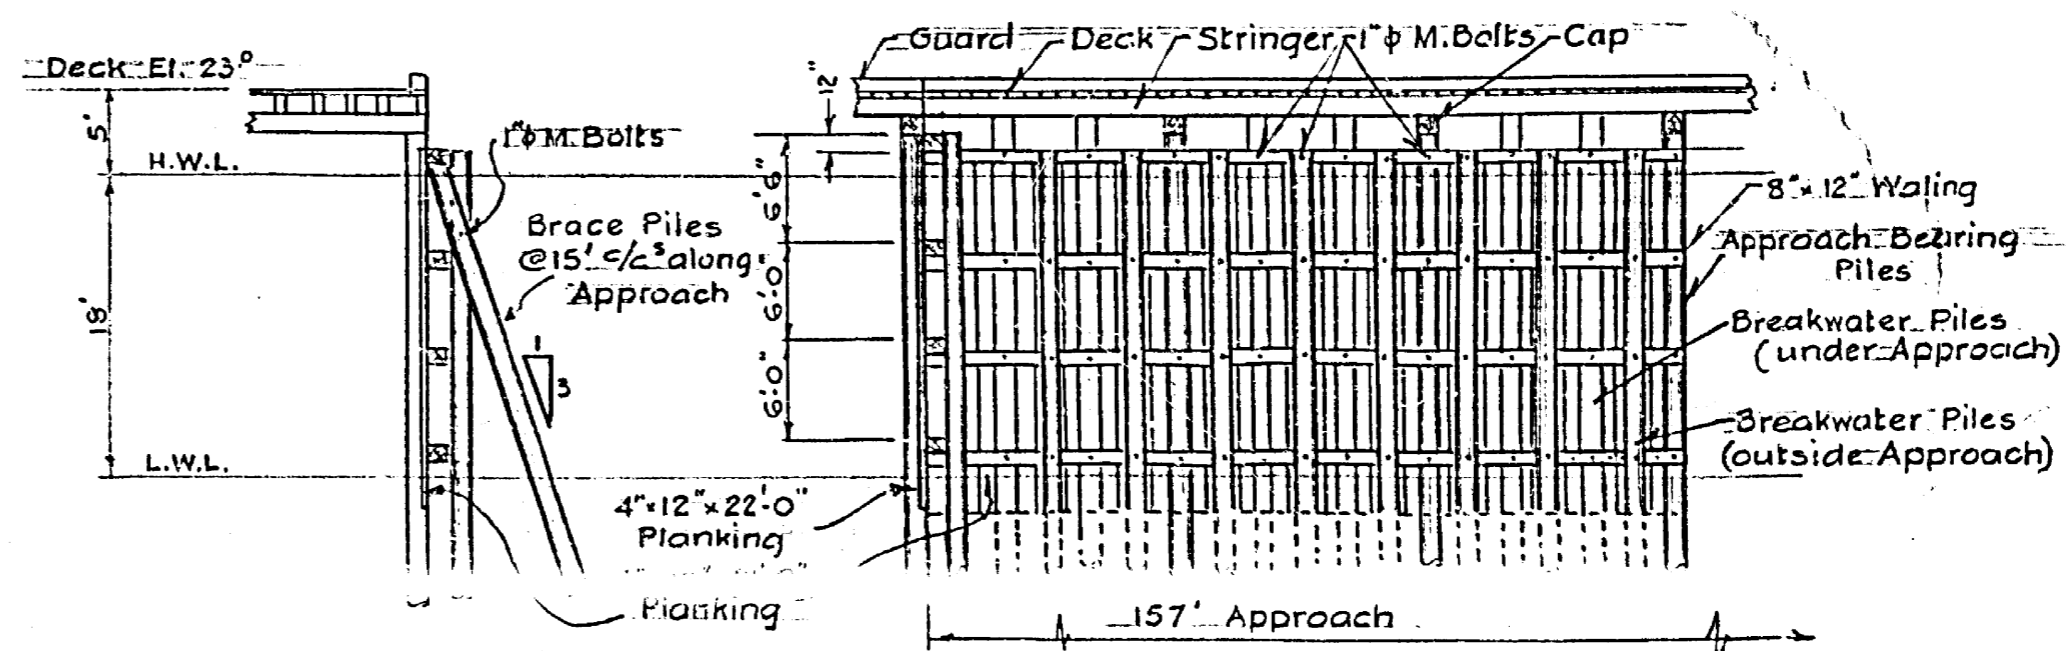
PART PLAN OF BREAKWATER AT INNER END OF NEW FLOAT
